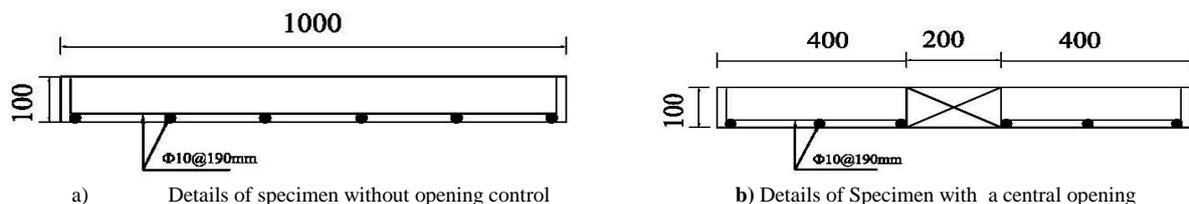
DIMENSIONS AND REINFORCEMENT DETAILS OF CONTROL SPECIMENS
